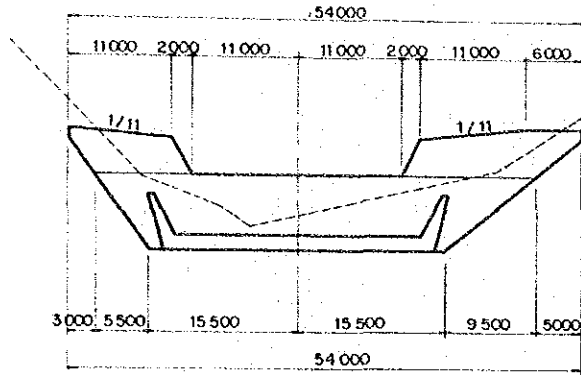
General Plan of Consolidation Dams in S. Cibangaran
